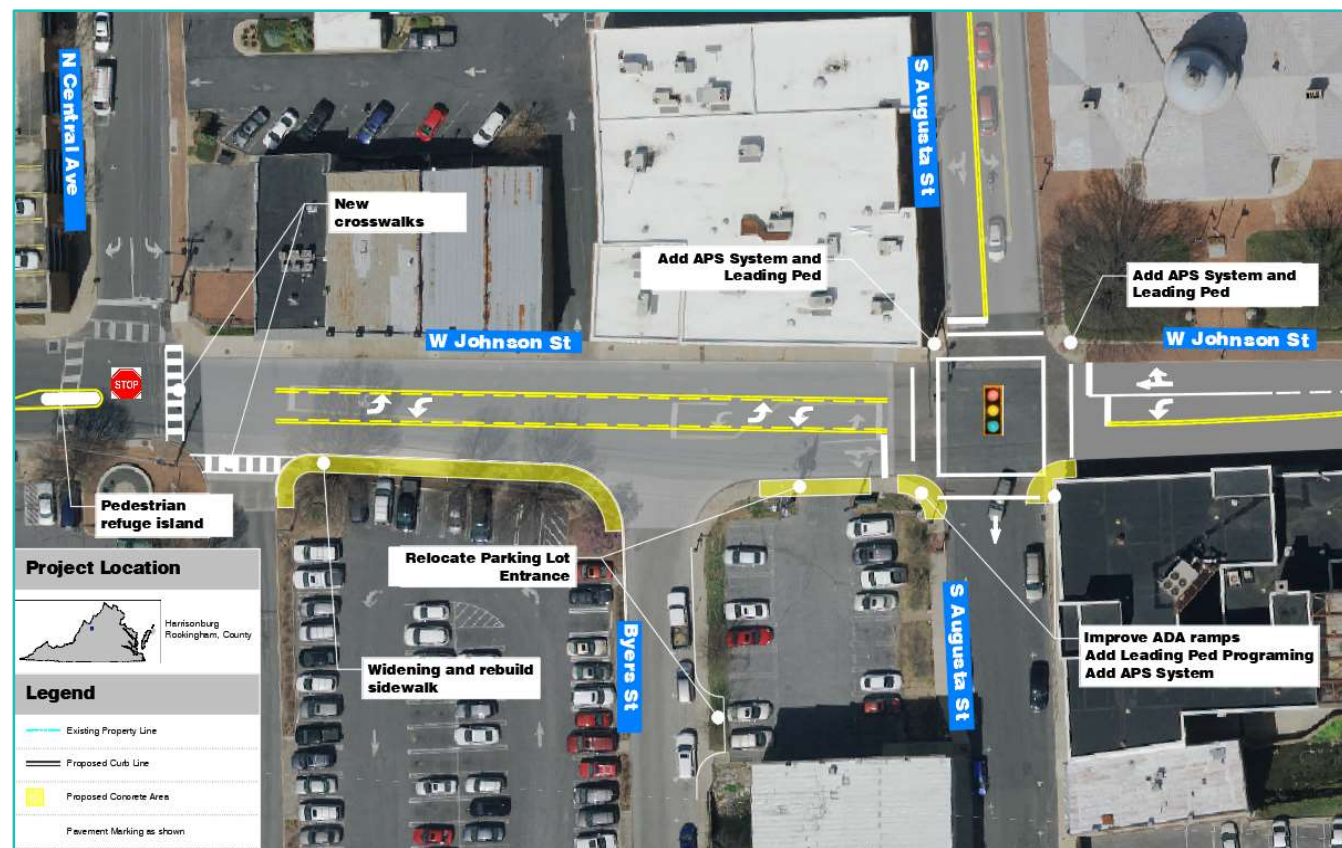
Alternative 3 Concept Sketch – West Johnson Street at Augusta Street
